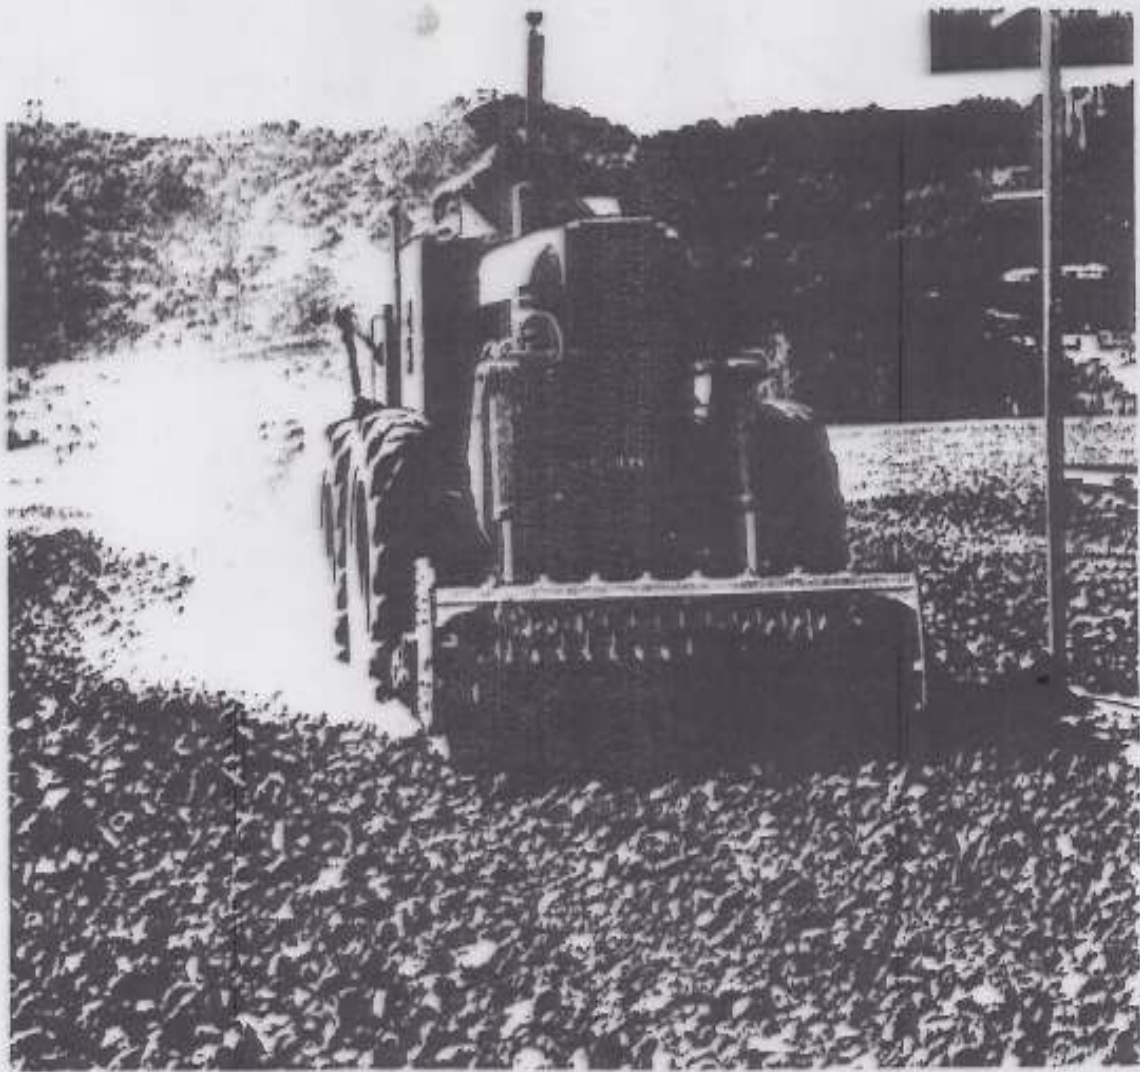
Compaction-cutter-crusher attachment processes an old bituminous surface. (Courtesy American Tractor Equipment Company.)
